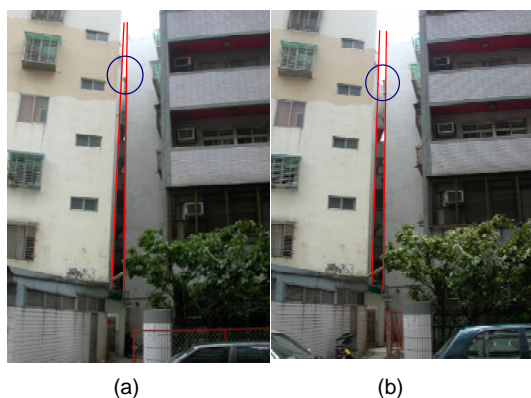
Grouting performance before fracture grouting (a) and after fracture grouting (b)
